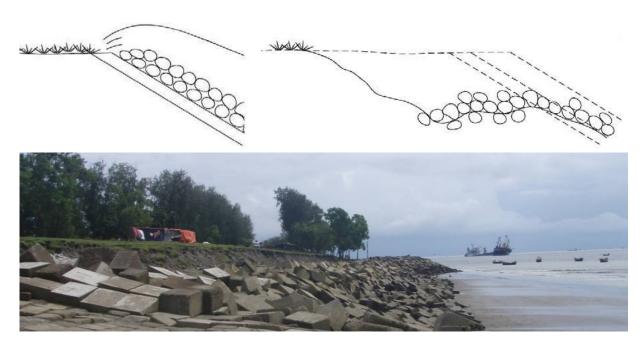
Concrete blockwork revetment failure due to wave overtopping (source Top: USACE 2011; Bottom: Chris Adamantidis)
